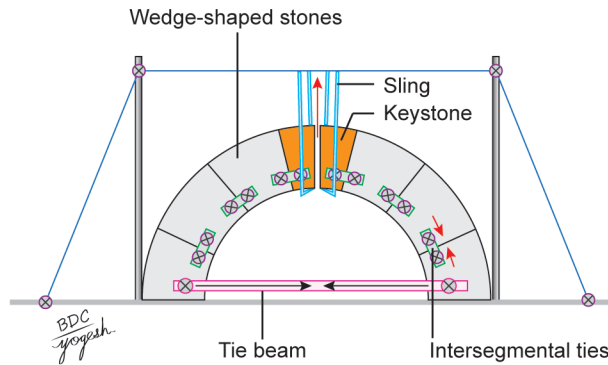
Concept of arches of foot and supports of stone bridge
